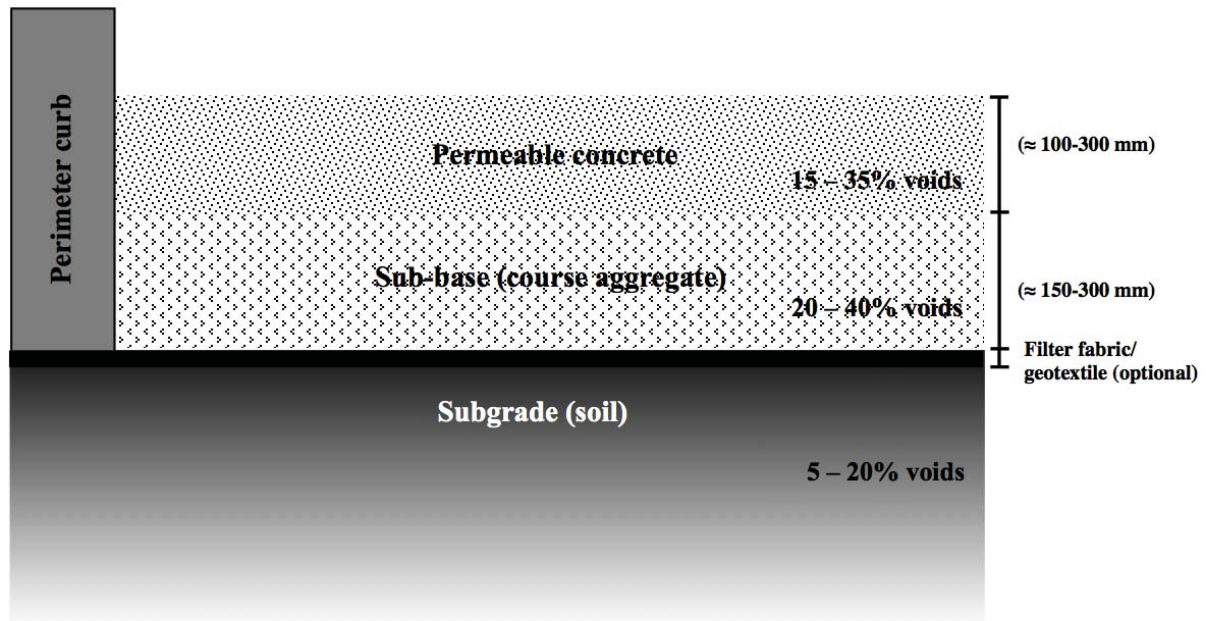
Schematic cross-section of a typical sustainable urban drainage system incorporating a permeable concrete layer.
